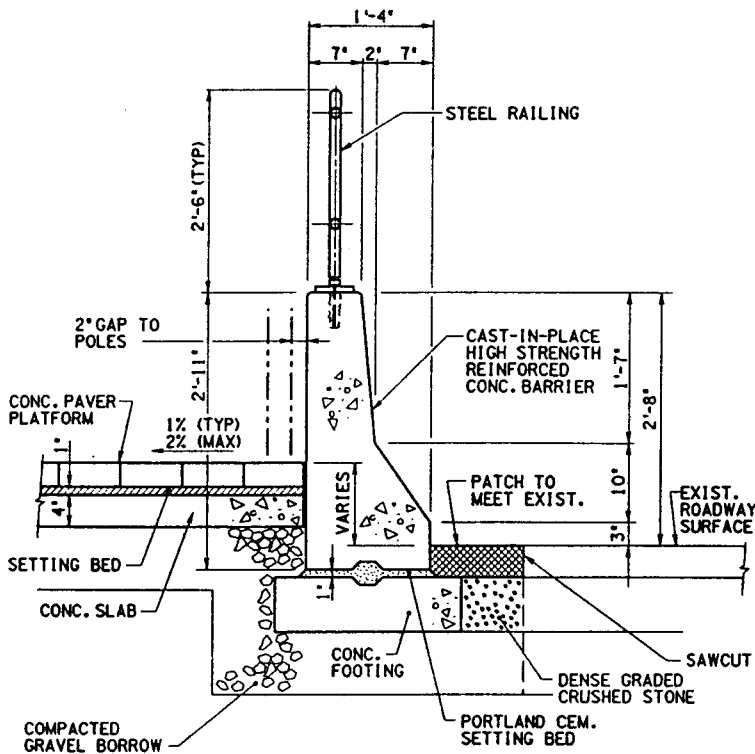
Possible Alternate Concrete Barrier Detail
